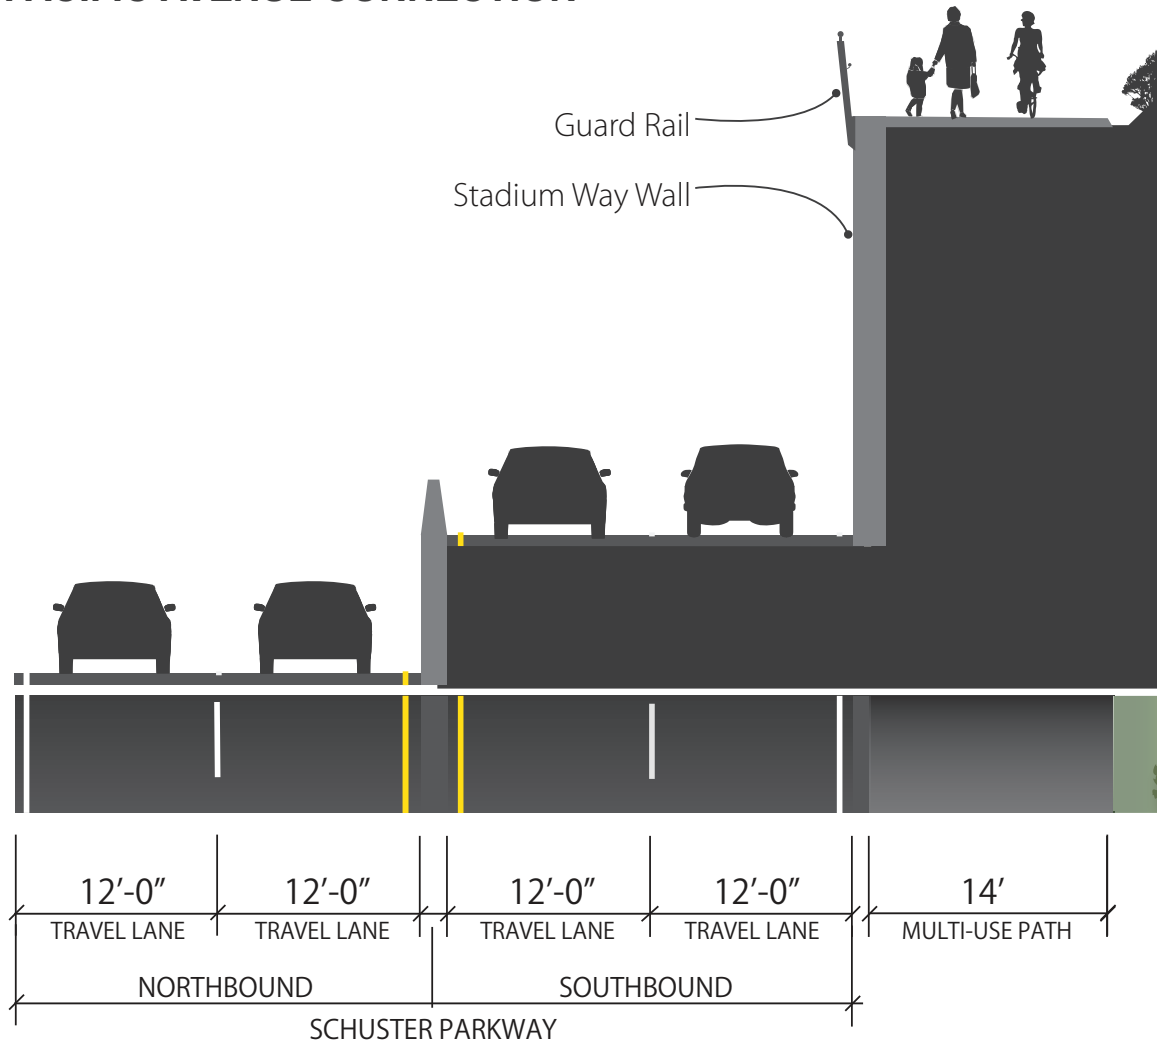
Pacific Avenue Connection - Section of Promenade Above Existing Stadium Way Wall
